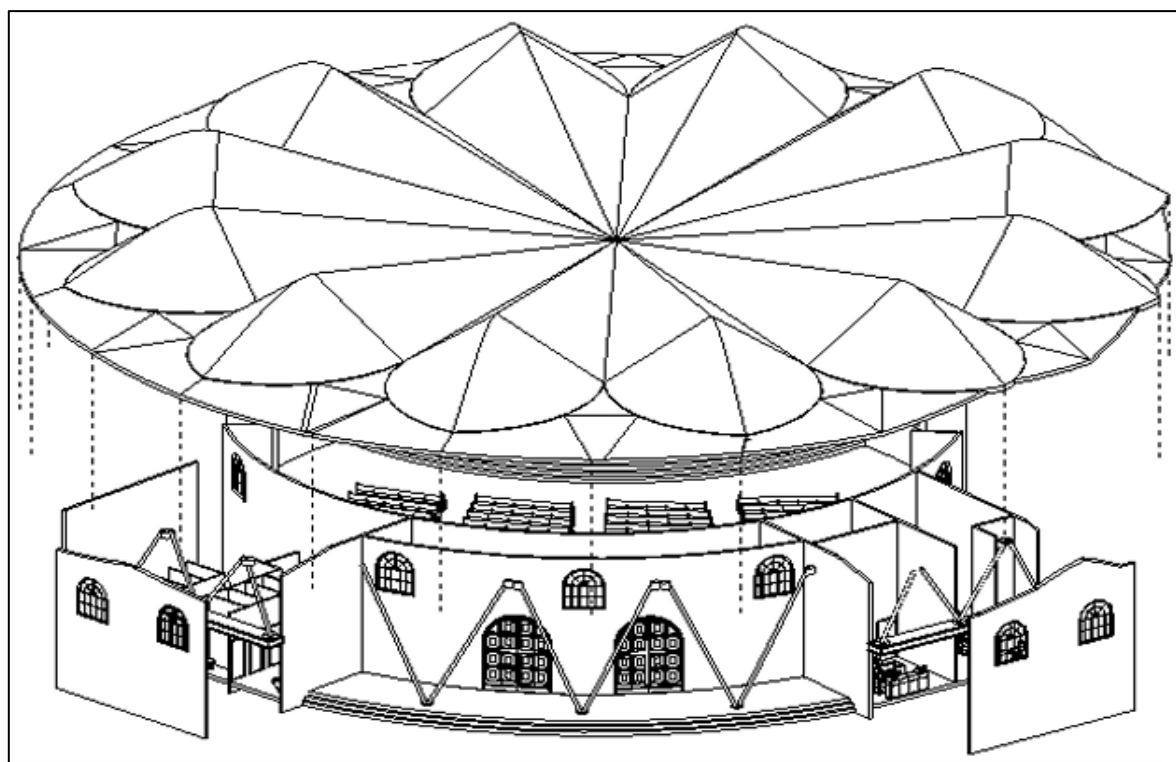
Exploded Axonometric View of the Multipurpose Hall
